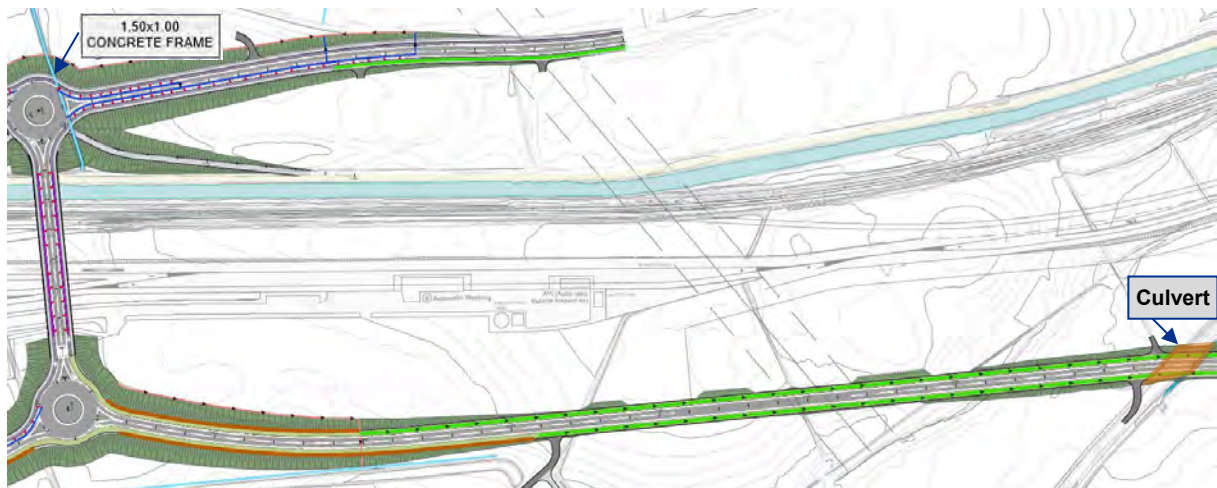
Concrete frame and underbridge for water streams under L5041
